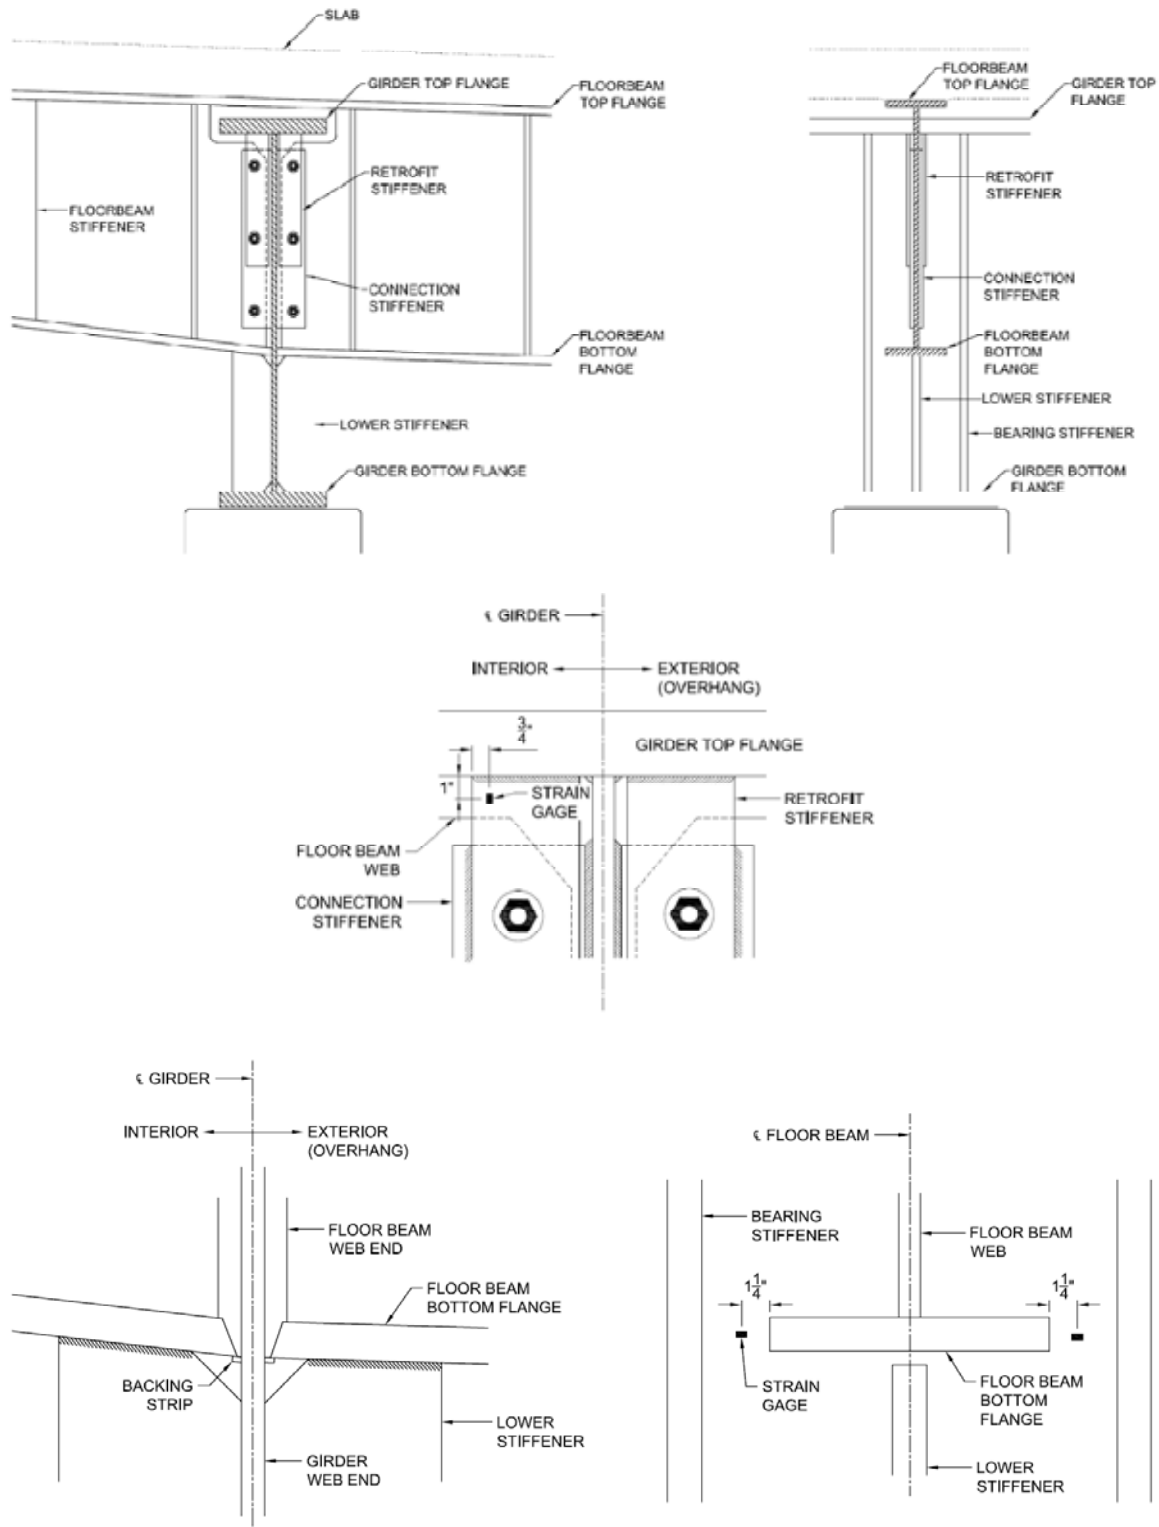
Section F17S Floor Beam 18 - Girder 1 Connection Details and Strain Gage Locations
